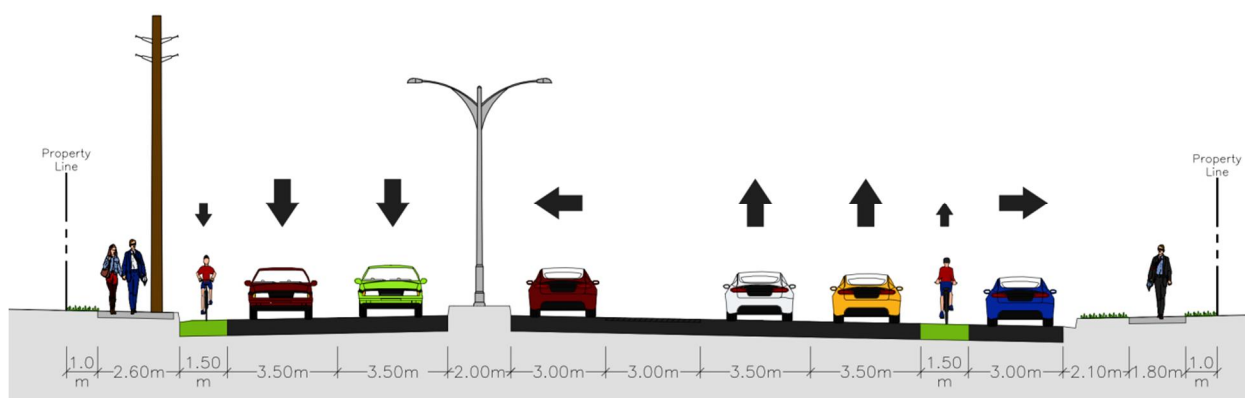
Preferred Design, Hamilton Road Cross-Section, West of Highbury Avenue North
